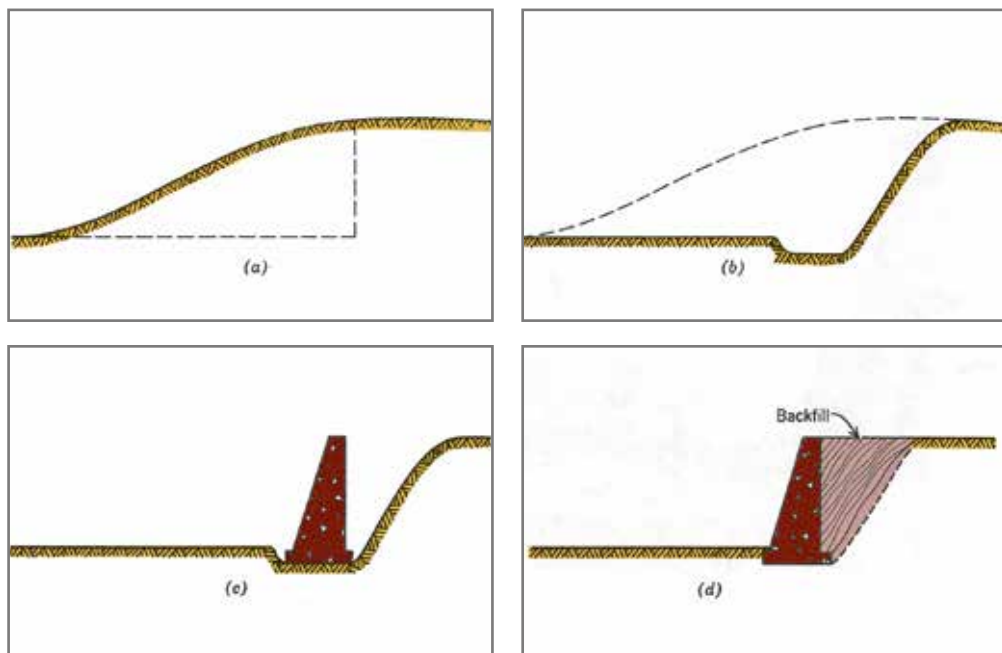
Stages in construction of typical gravity retaining wall. (a) Proposed excavation. (b) Excavation completed. (c) Wall formed and poured. (d) Backfill placed. (Lambe & Whitman, 1979, mod.)
